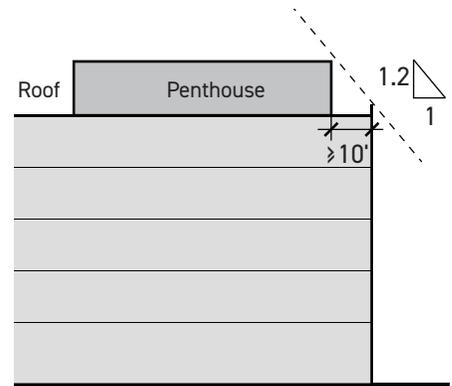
PENTHOUSE STRUCTURE REQUIREMENTS
